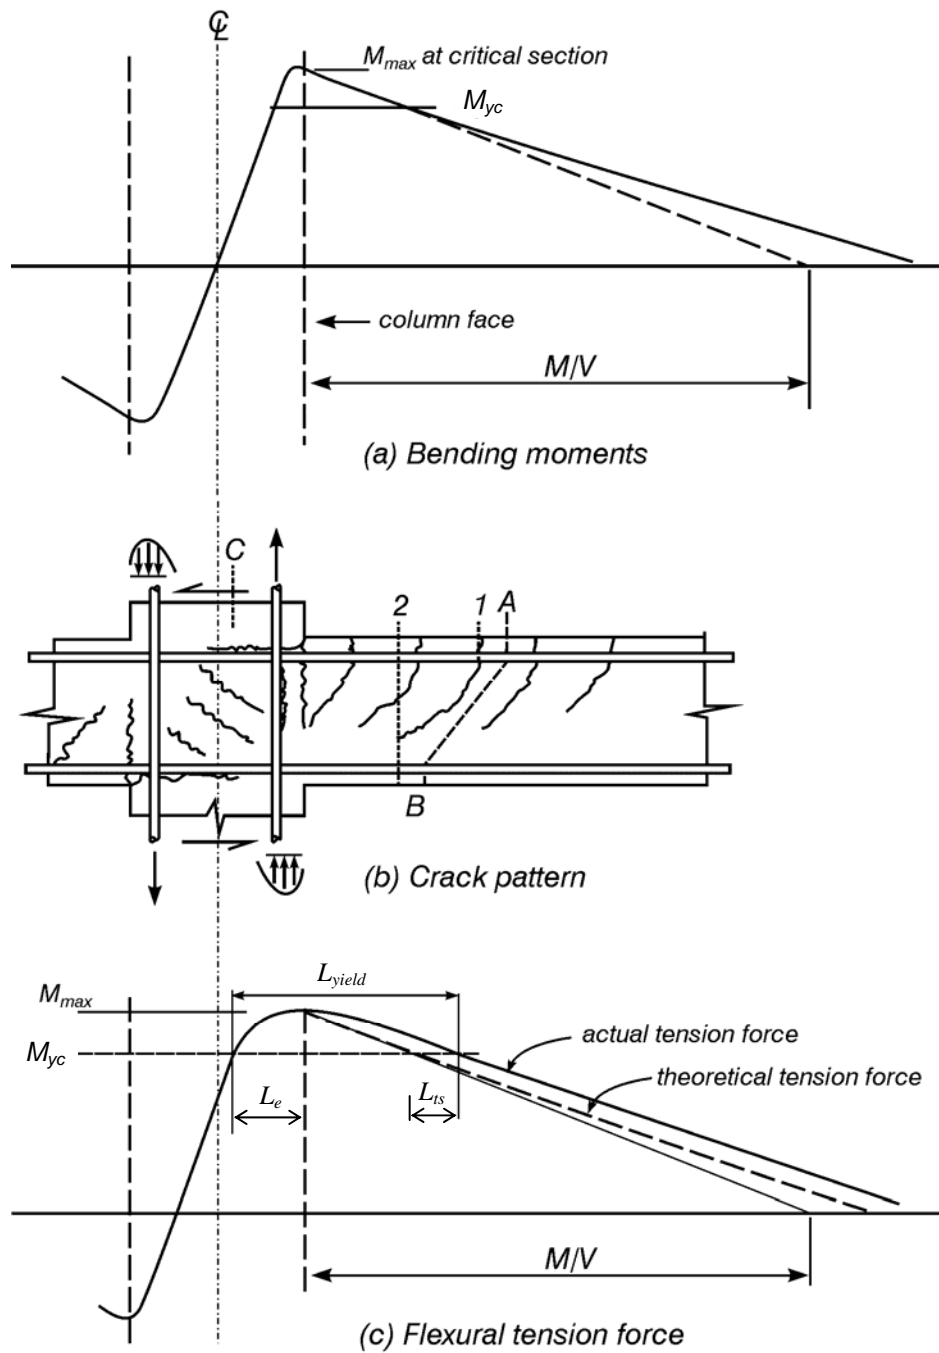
Moment, crack pattern and internal tension force in a beam
